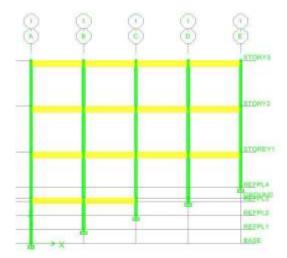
Elevation of step back building for three storey model (300 slope)
